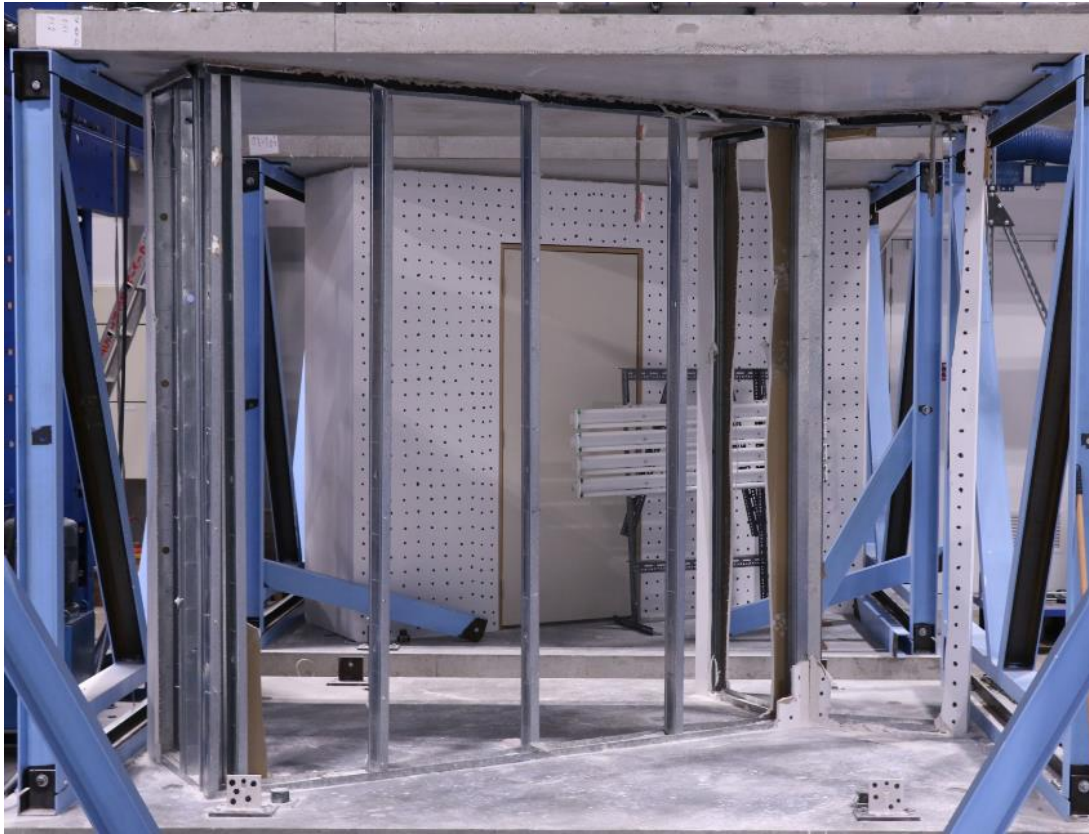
Specimen A2 – Post-test framing inspection —steel framing with linings removed
